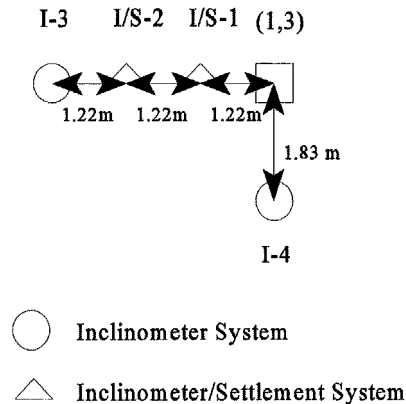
Plan view of positions of instrumentation systems around the pilot study location.
